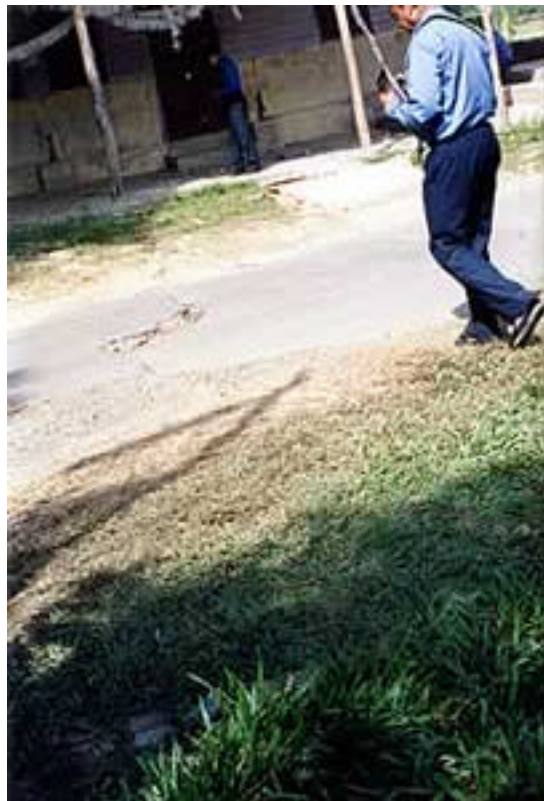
A ground fissure cutting across the road through Anganbari Community Centre, Collinpur
